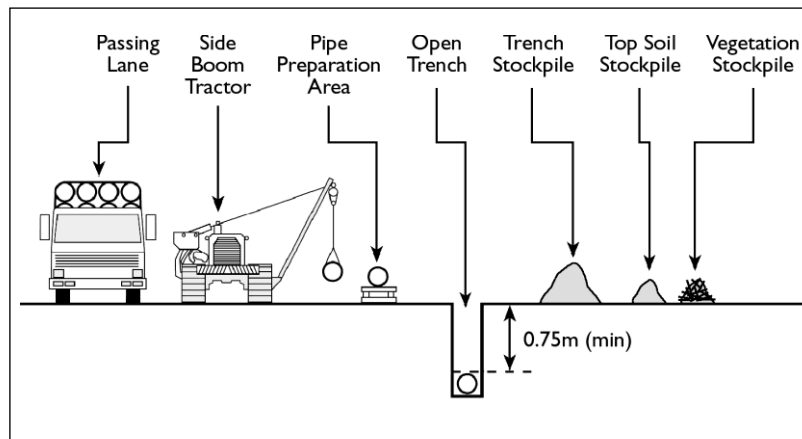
Typical construction of ROW layout for buried steel pipeline installation
